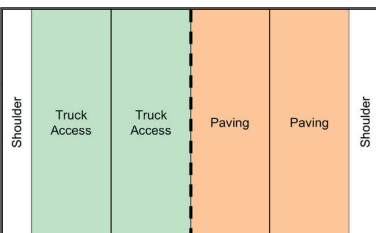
Concurrent Construction - Reconstruction of Two Lanes
